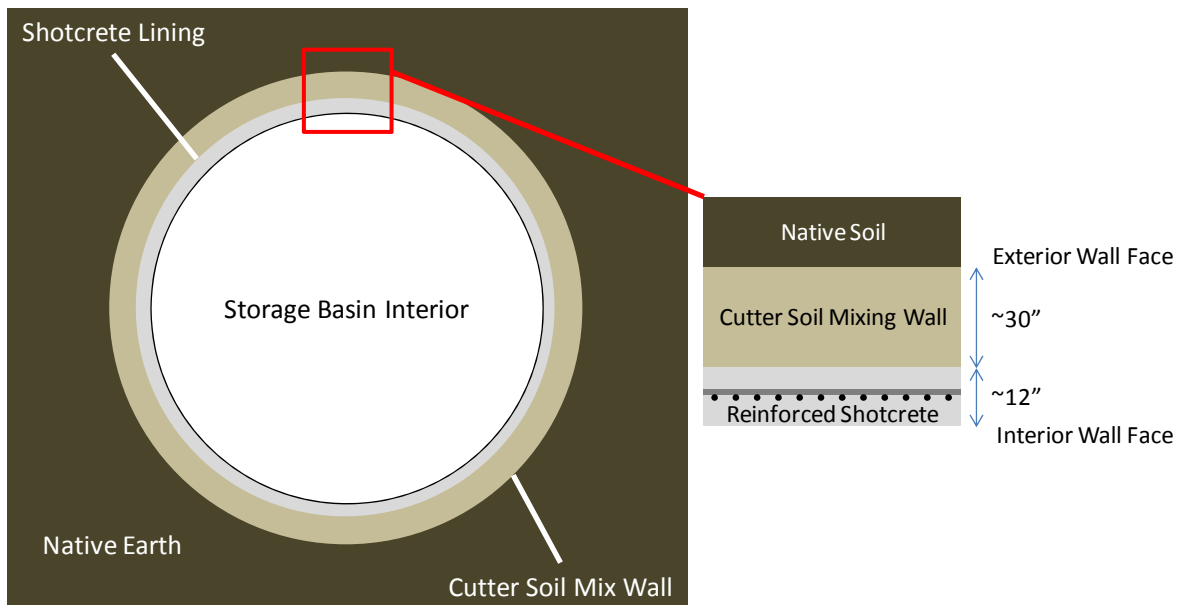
Plan View Excerpt of Cutter Soil Mixing Wall Panels
